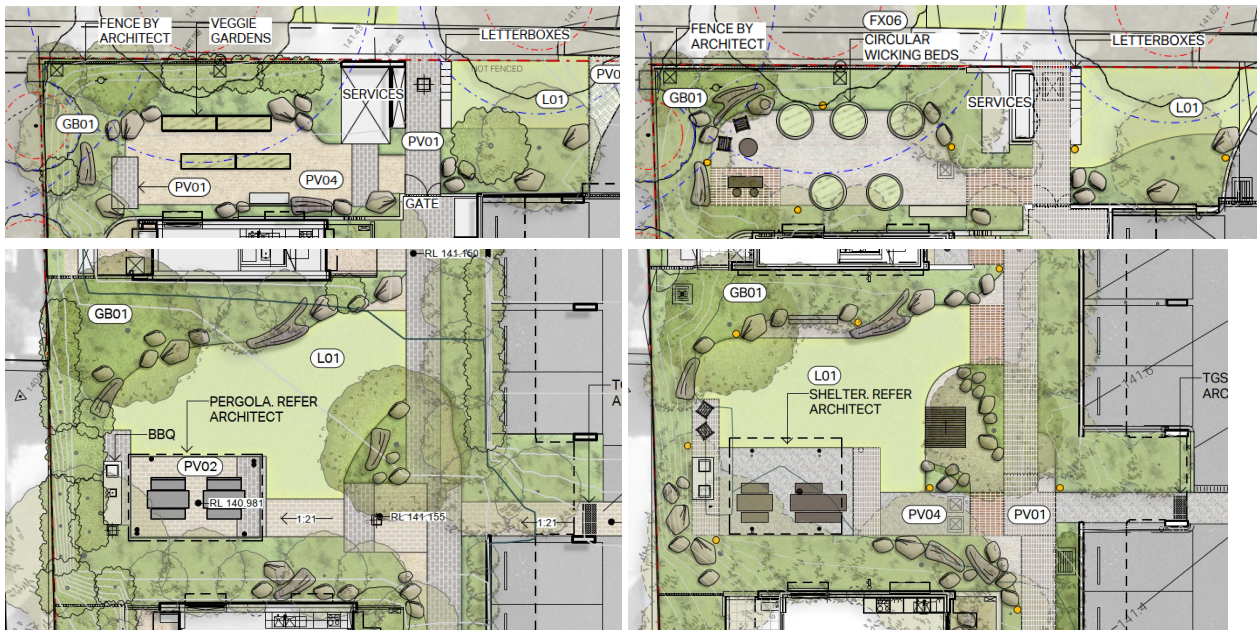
Decision plans (left) and proposed plans (right) showing updates to communal area design.
